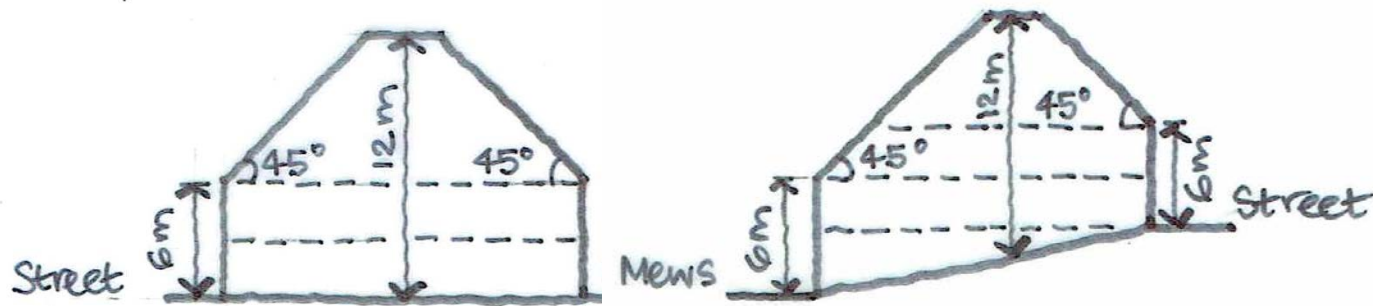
Typical sections through a flat lot and a sloping lot showing the building envelopes.
